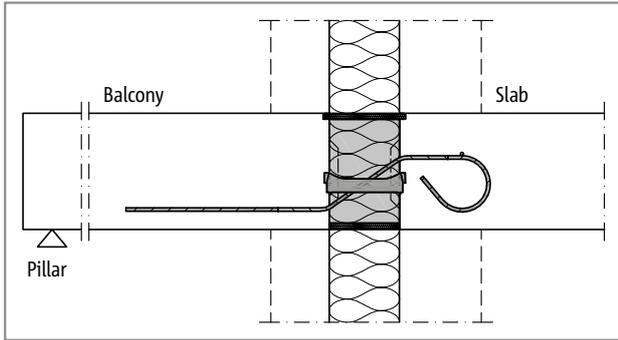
Schöck Isokorb® XT type Q: Connection with non-load-bearing double wall masonry (XT type Q-V1 to V4)
